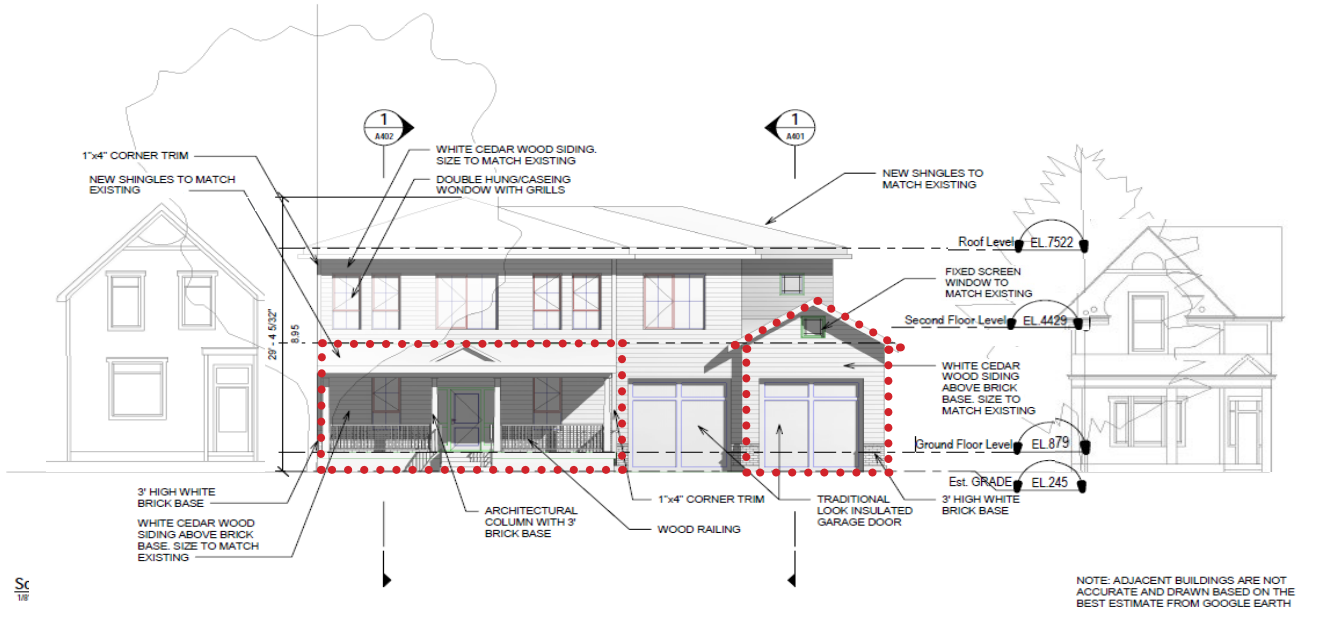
Front/South Elevation. Red dotted lines indicate existing outline of original house and garage to be incorporated into proposed addition/renovation. Drawing by Third Layer Architects, 2021.
